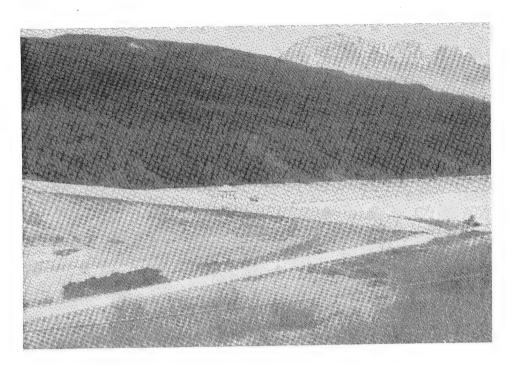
Precast panels held in place by metal strips embedded in earth, Lake Sherburne Dam
